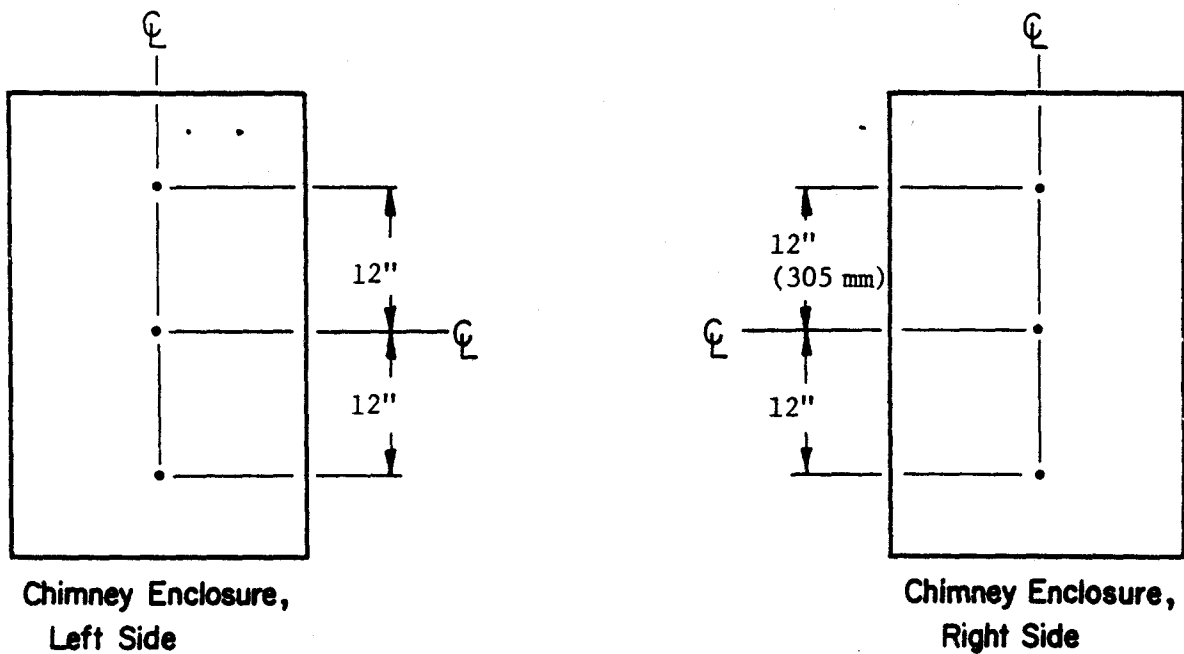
Masonry Thermocouple Locations, Chimney Enclosure
